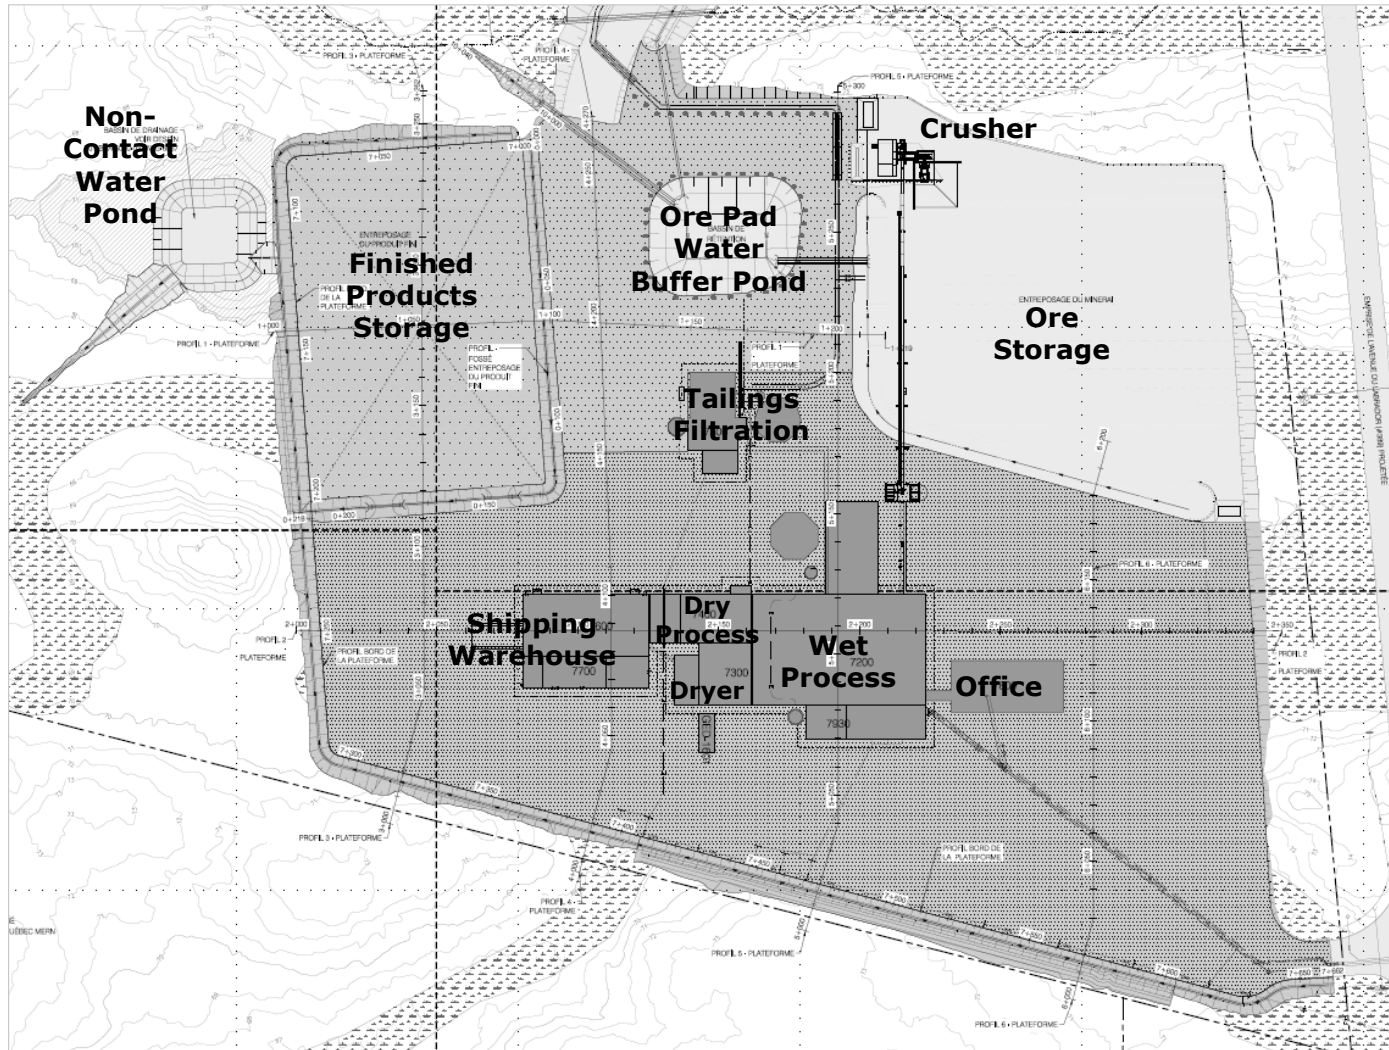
Baie-Comeau Site Plot Plan – Industrial Area
